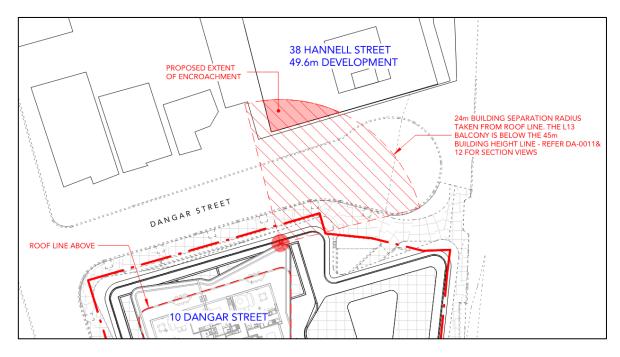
Extract of 'Building Set Back Plan' (source: Team 2 Architects)
